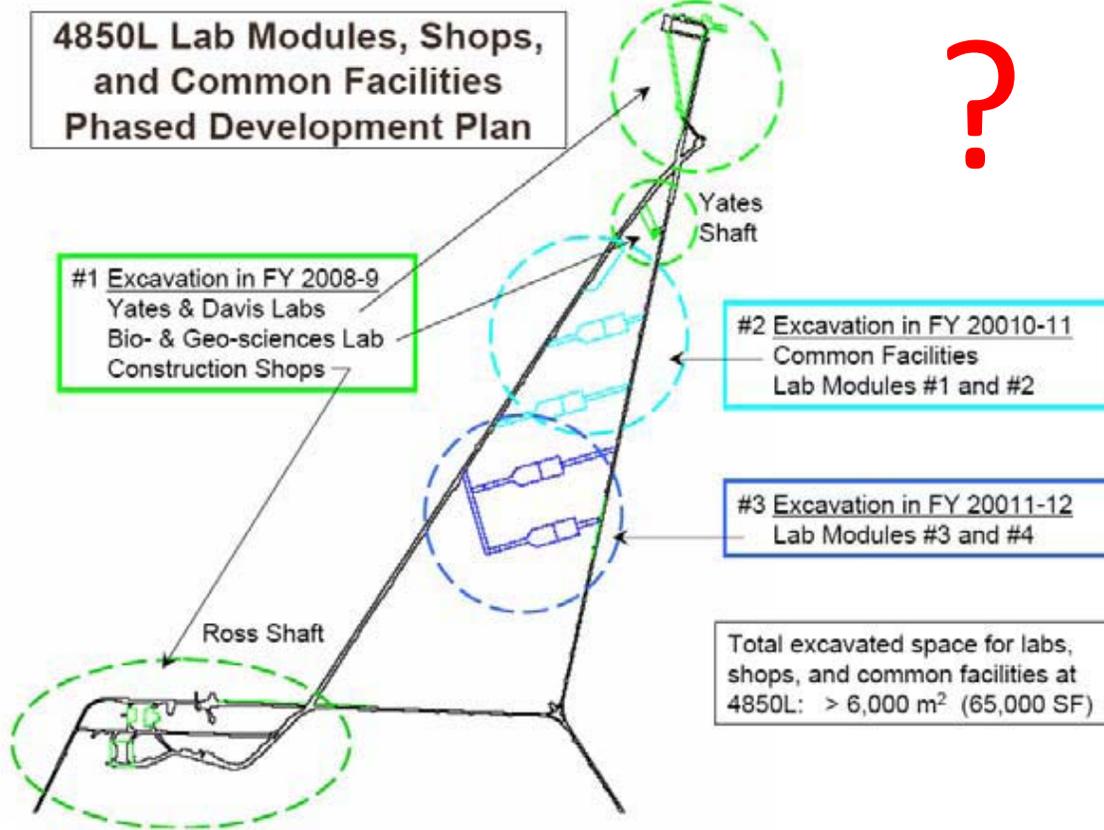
Proposed new excavations at 4850 level - as outlined in CDR – 2007
